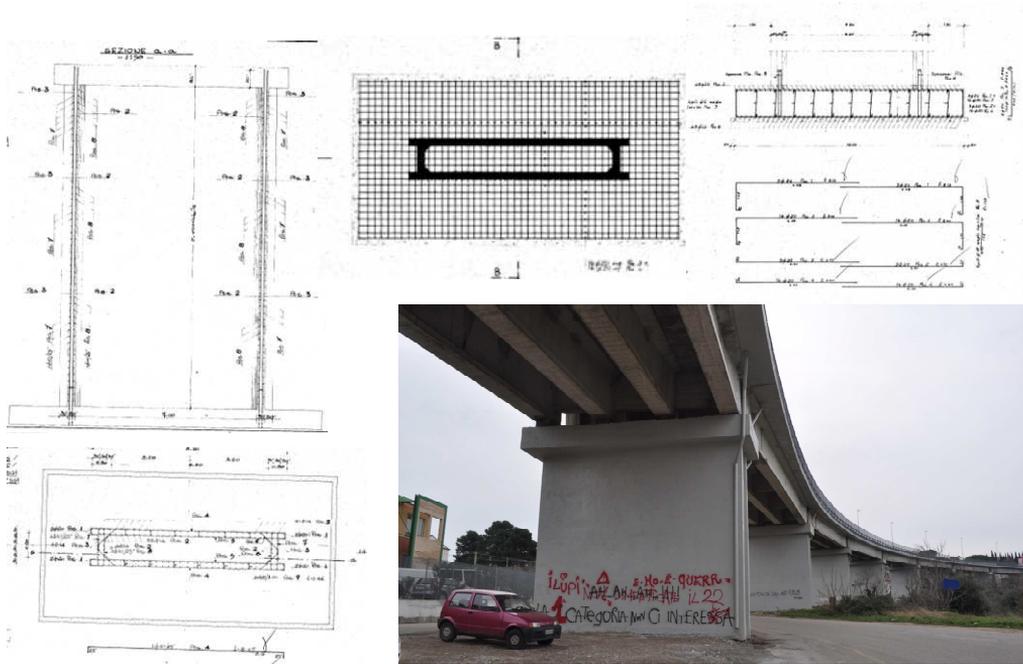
Example of viaduct with short hollow rectangular piers and shallow foundations
